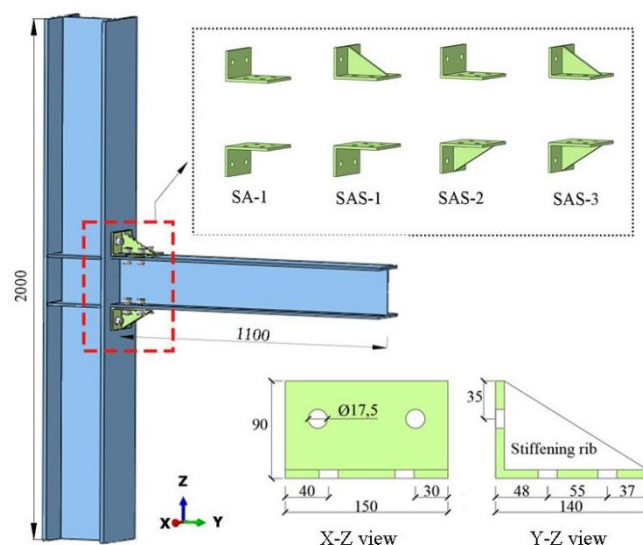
Detailed constructions of test specimens in Ref. [14] (Unit: mm)
